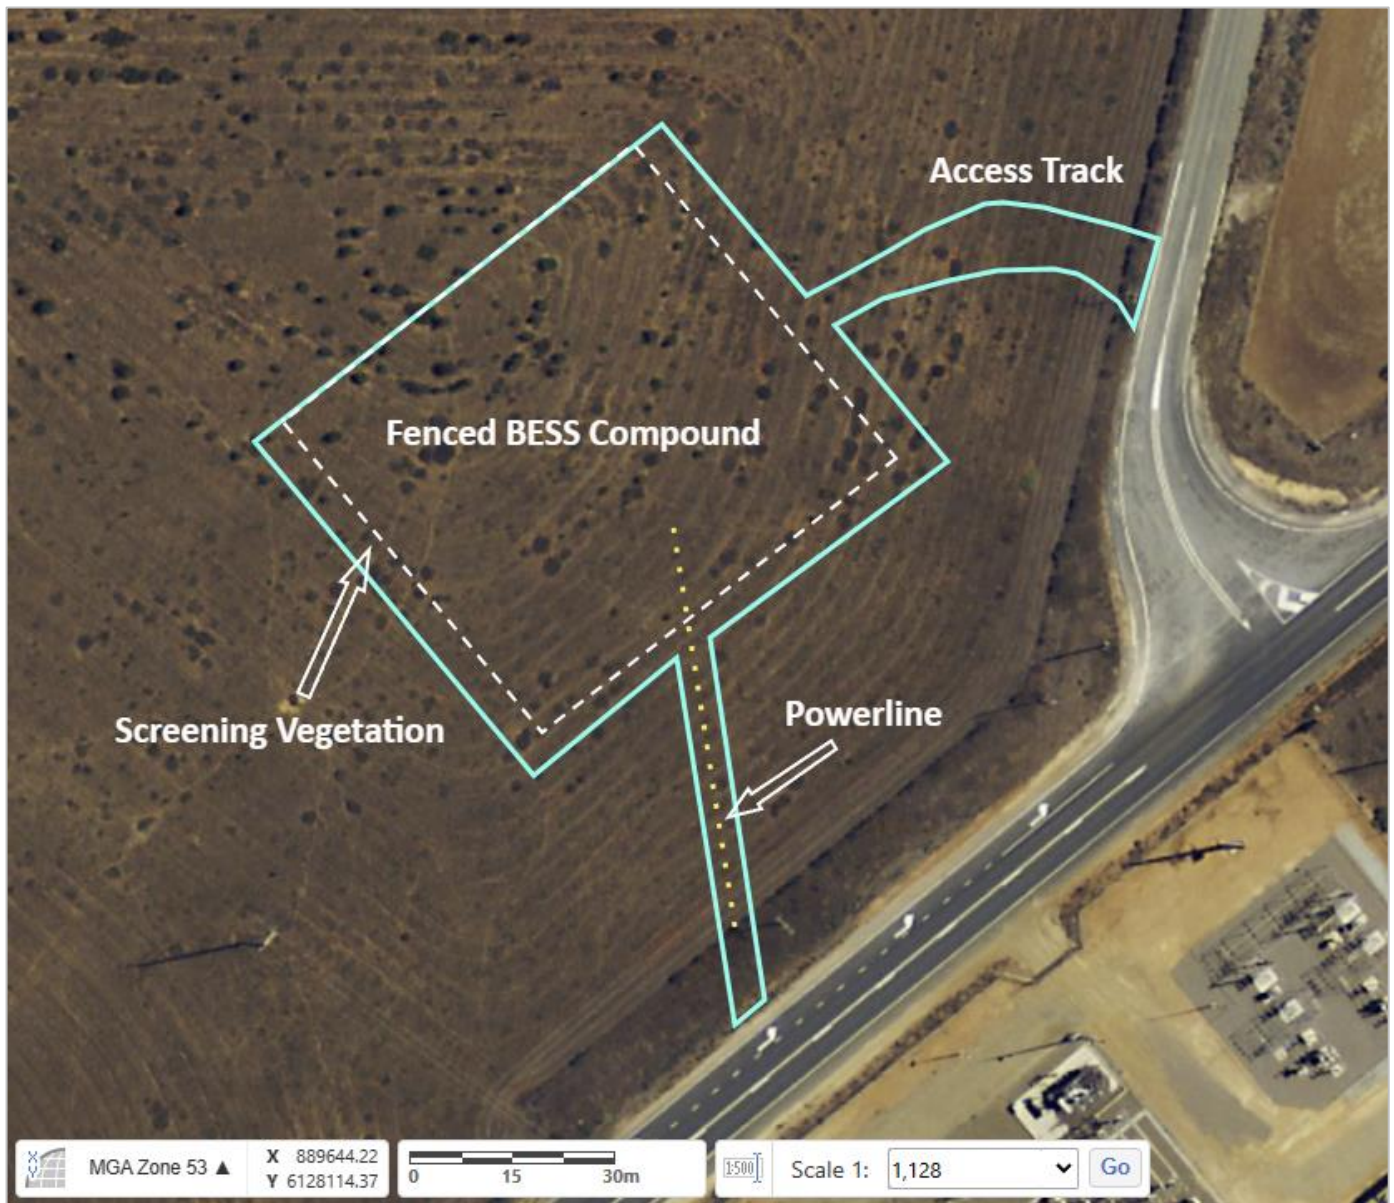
Site plan showing proposed works, with the extent of the clearance area outlined in blue
